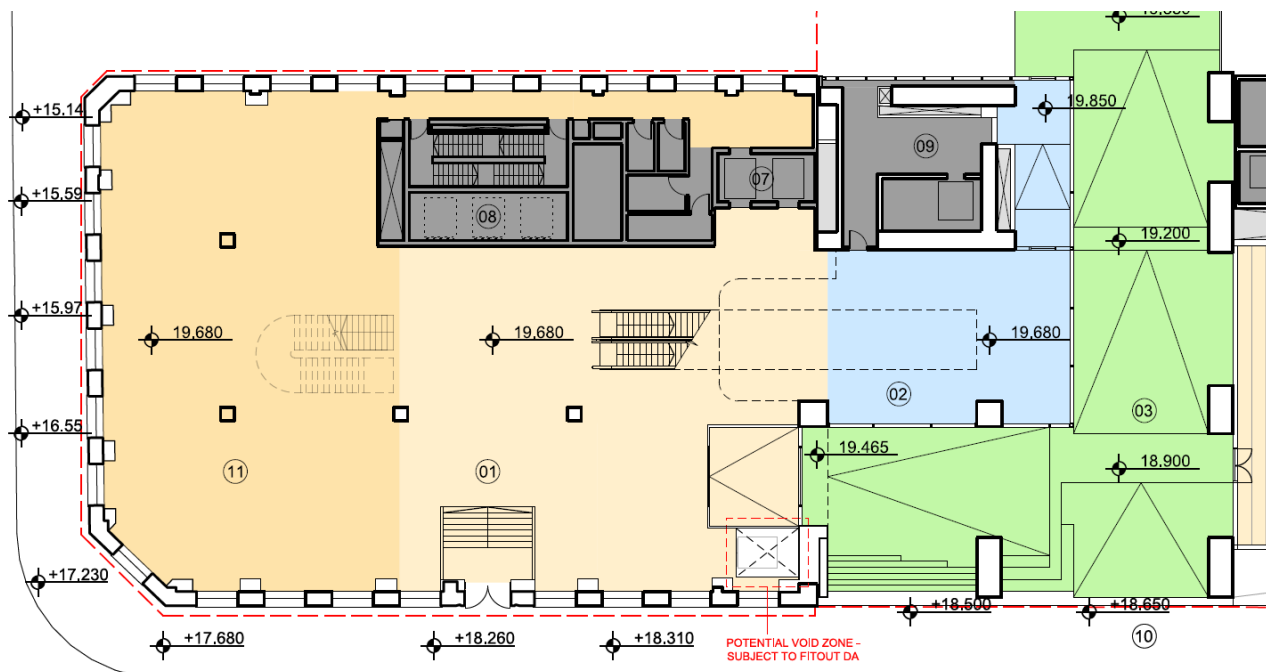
The Carrington Street level showing the amended void zone and Condition B40(a) and (c) layout
